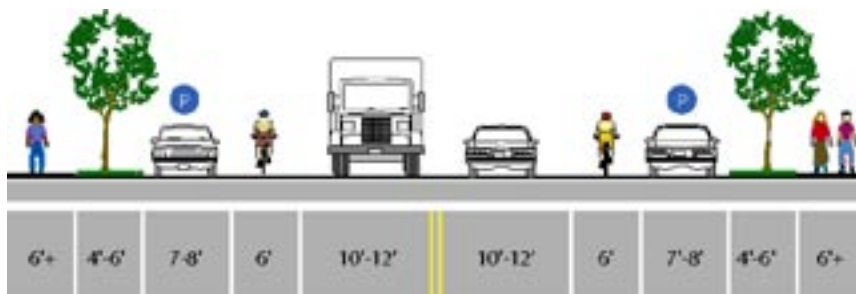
Option 1: Bike Lane with On-Street Parking
